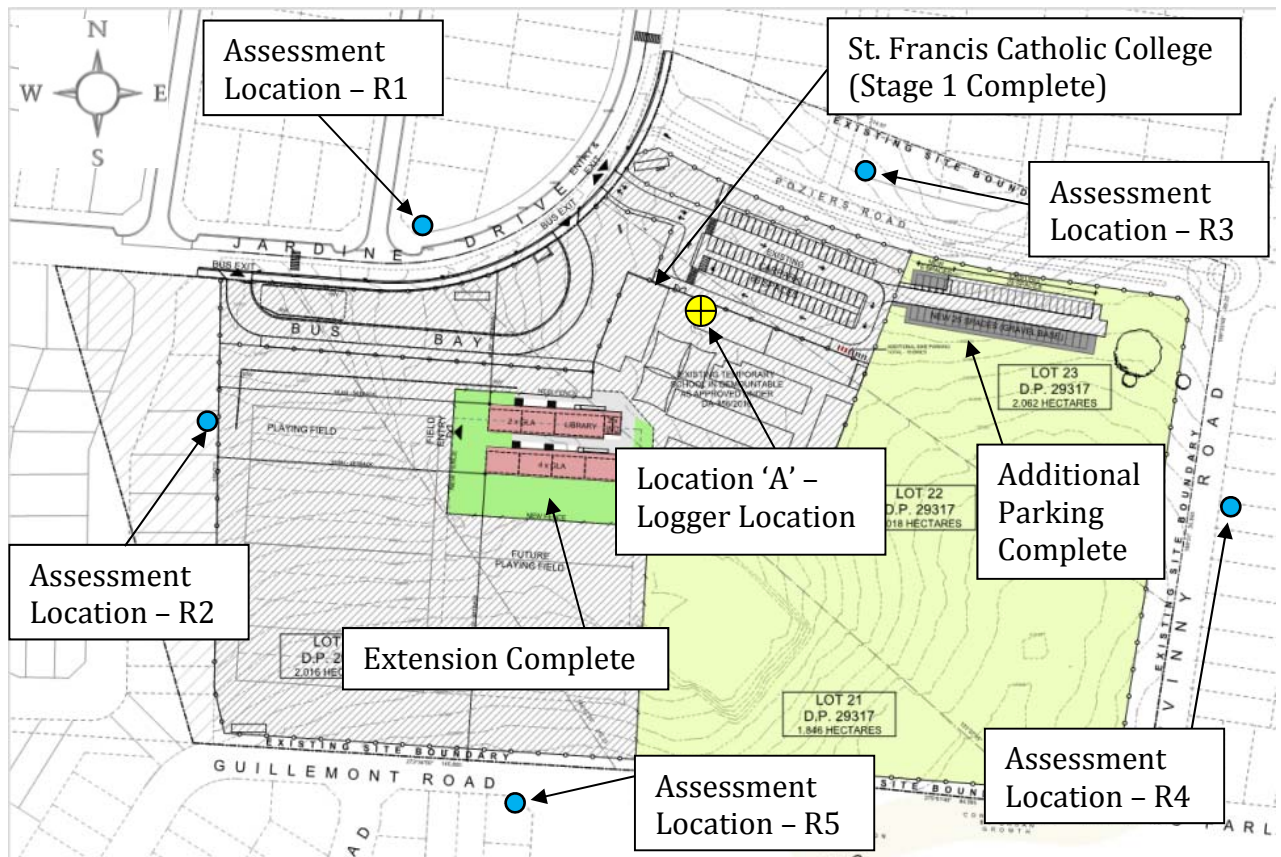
Location Plan, 130 - 160 Jardine Drive, Edmondson Park
